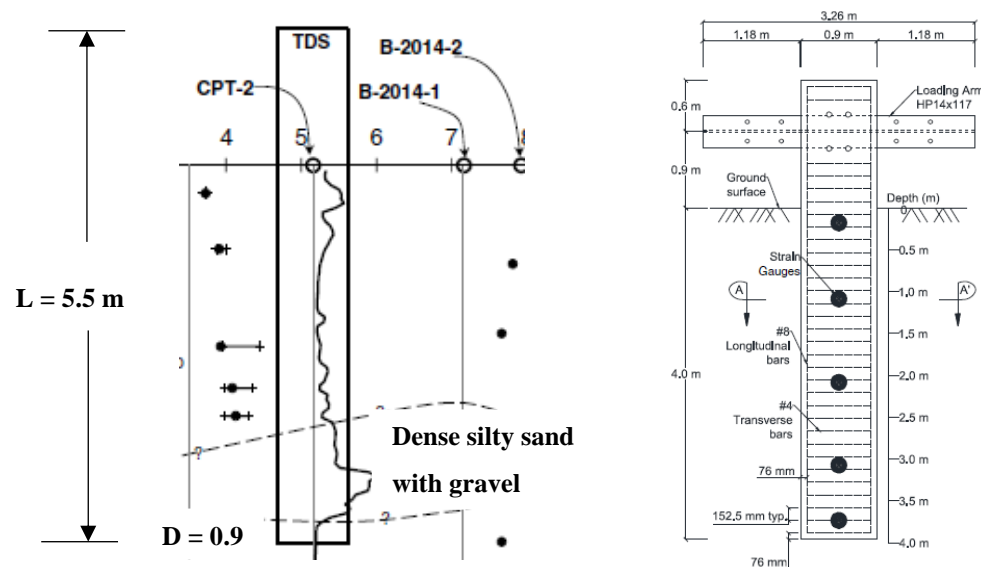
Subsurface profile at test and test details (Qiang et al. 2017)
